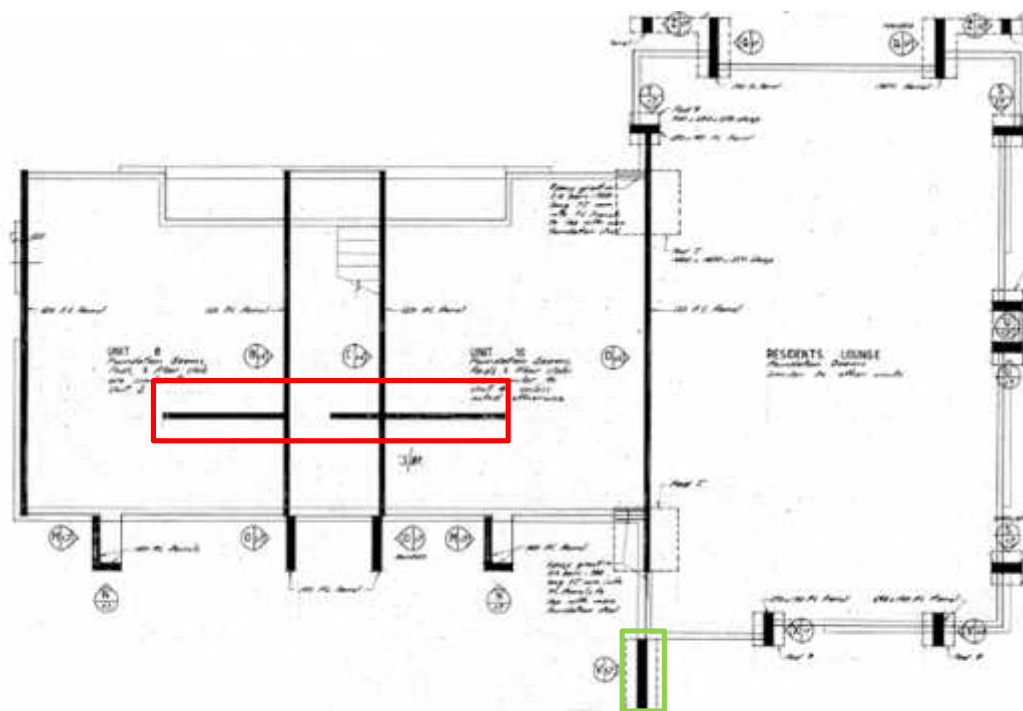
Locations of strengthening brackets (red rectangle) and replaced wall (green rectangle) in Block B.
